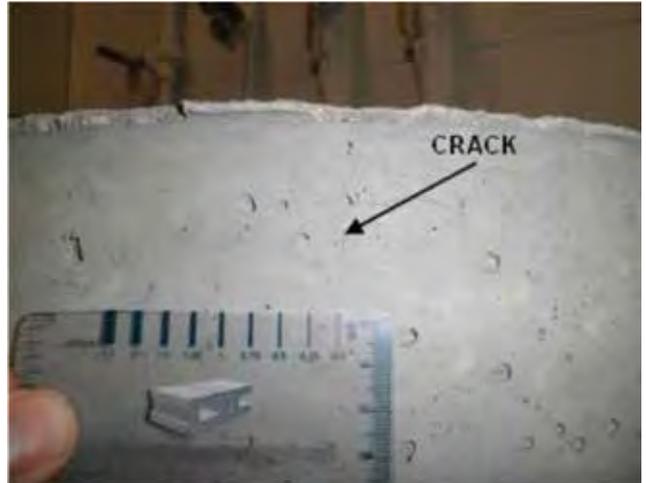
Typical crack width of 0.004 in. (0.1 mm) in CRA-treated concrete specimens
